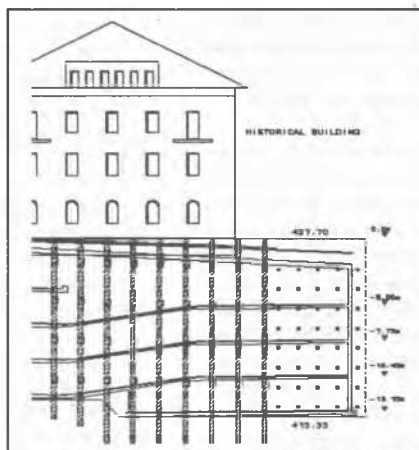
Face View of the Described ERS at Monthey Showing the Transition Between Soldier Pile Wall and Nailed Wall.
